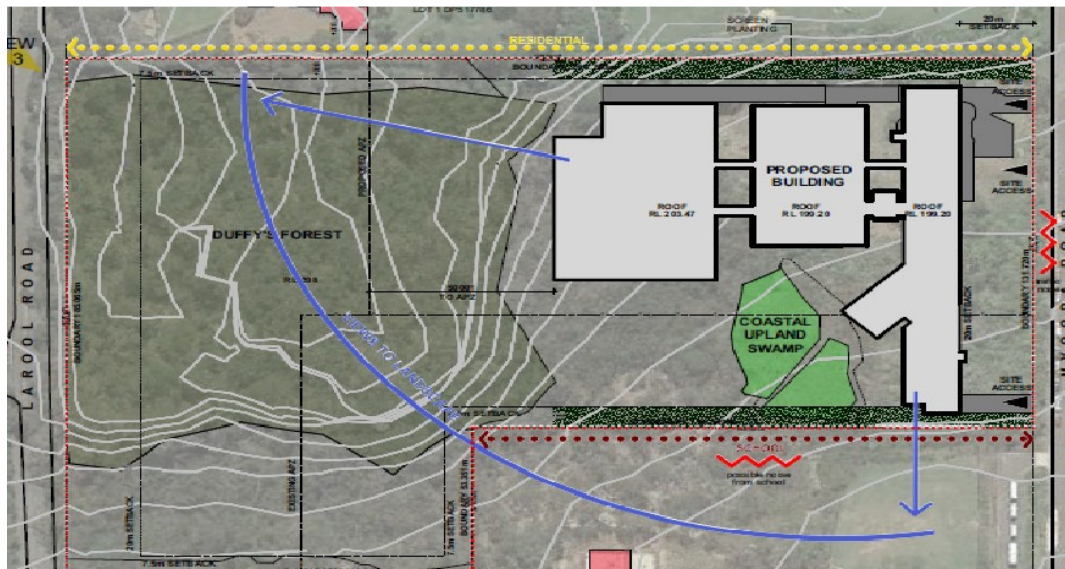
Site Plan (Source: Site Analysis Plan dated 28 April 2017 and prepared by Bureau SRH Architecture)
